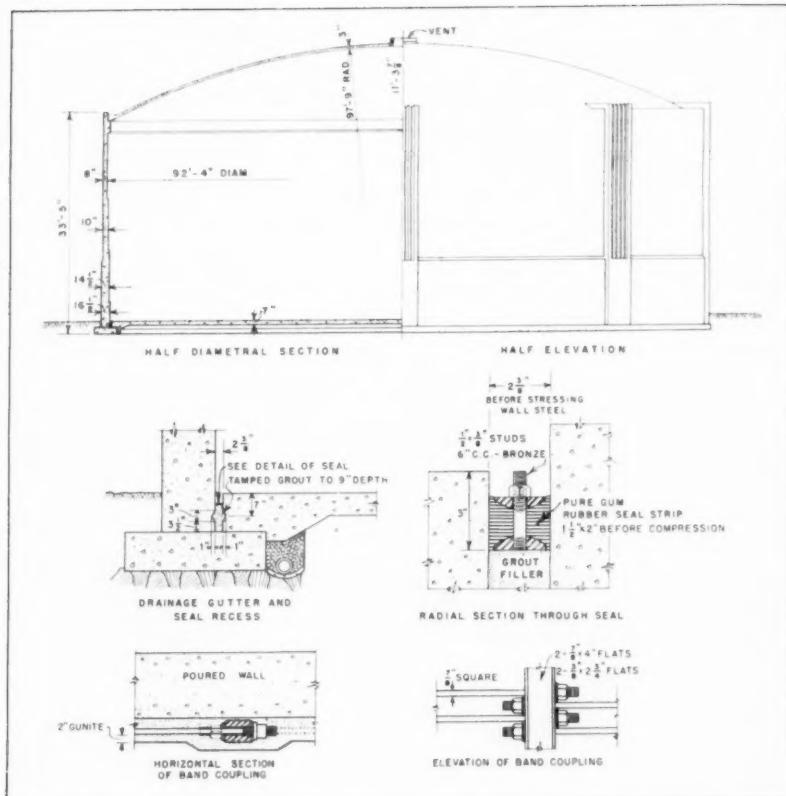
Detail of Reinforcement on Pre-Stressed Concrete Reservoir
